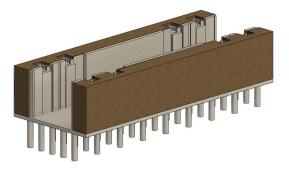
Step 6: Casting the 60 cm Concrete Wall
